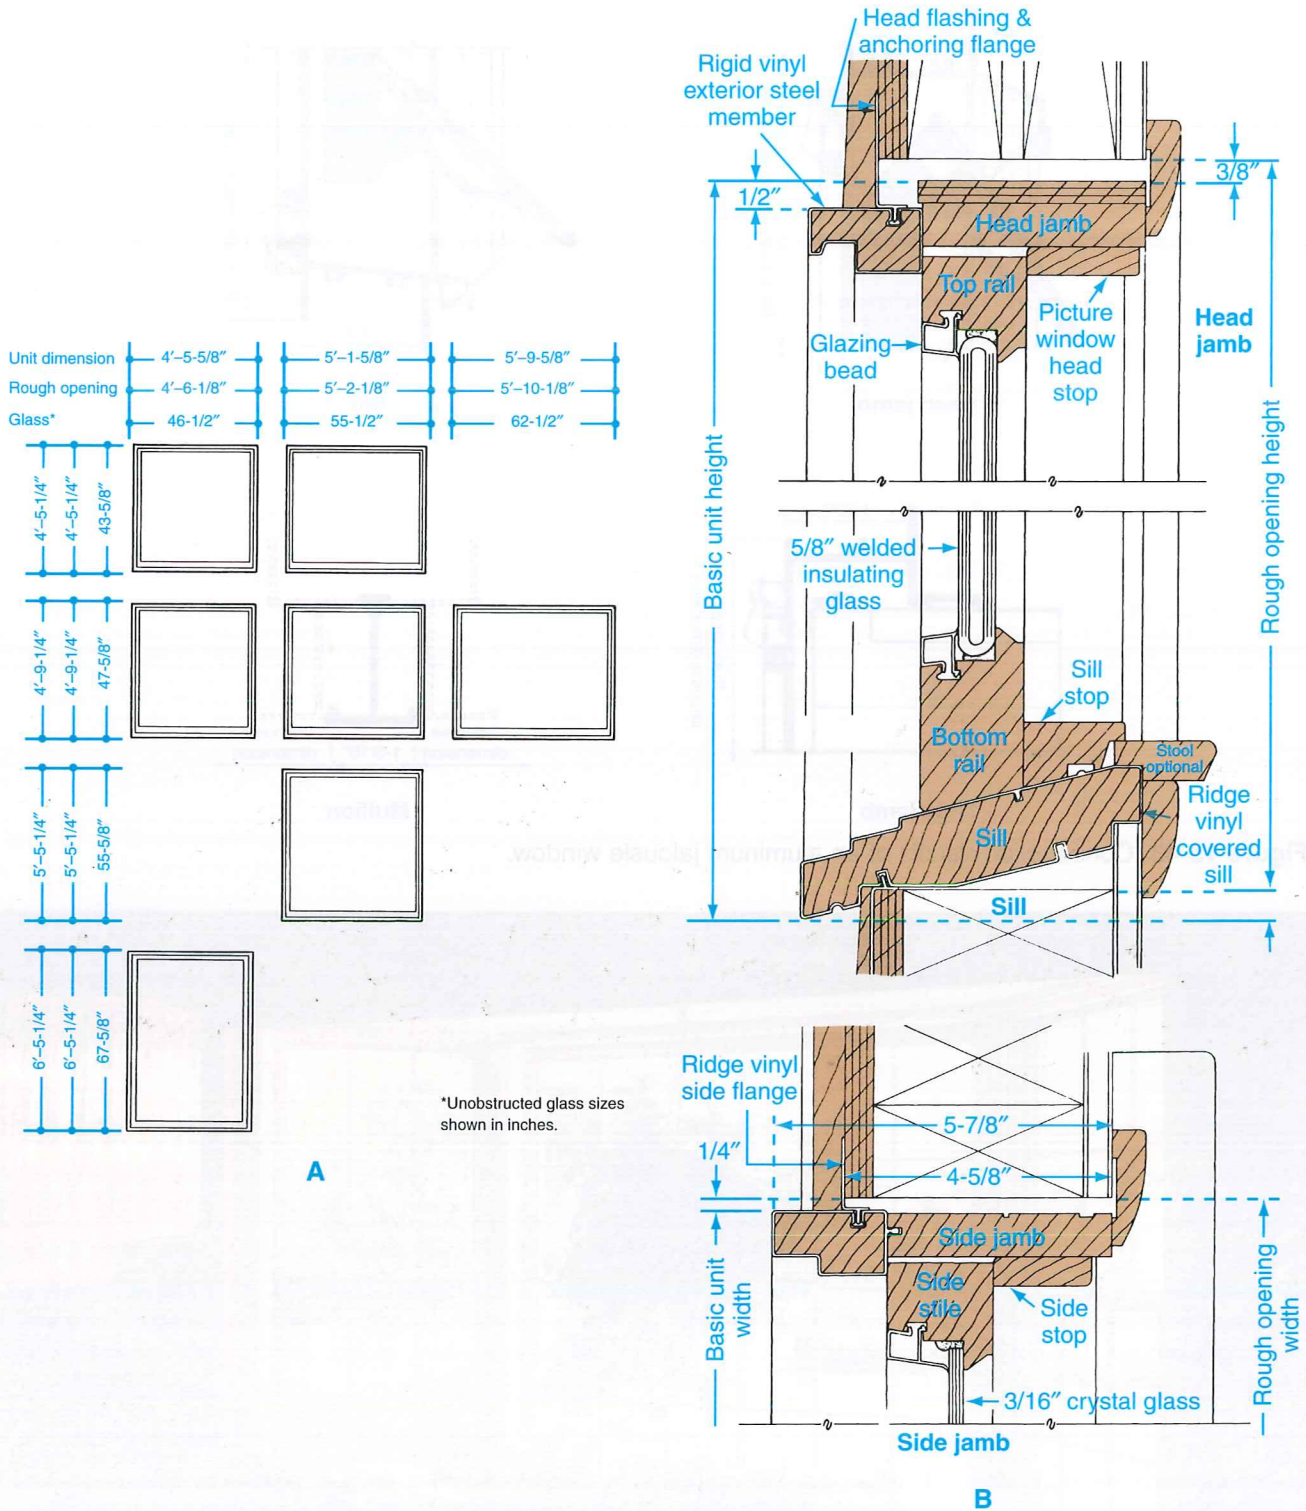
A—Standard picture window sizes in sash units. B—Construction details of a picture window.
